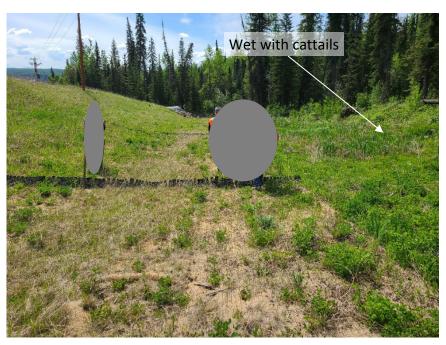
Flowing water and cattails at WP212along north side of toe berm at GP038-I site. Photo taken June 15, 2022, facing north.
